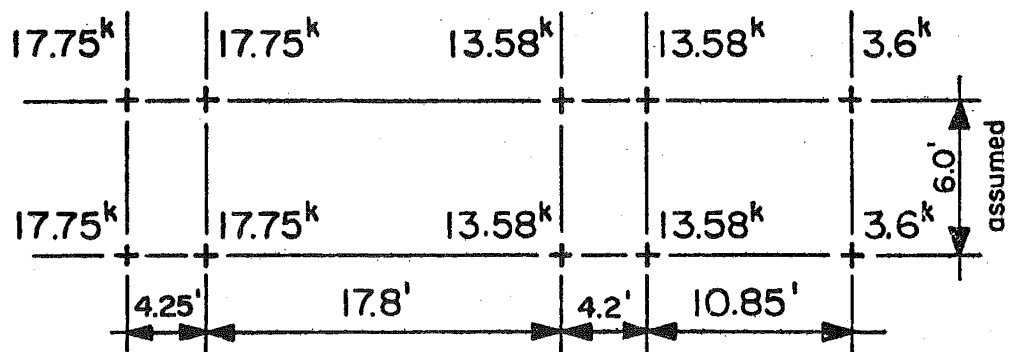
4-Span Continuous, Steel Composite Bridge with Static Loading on Span 2
